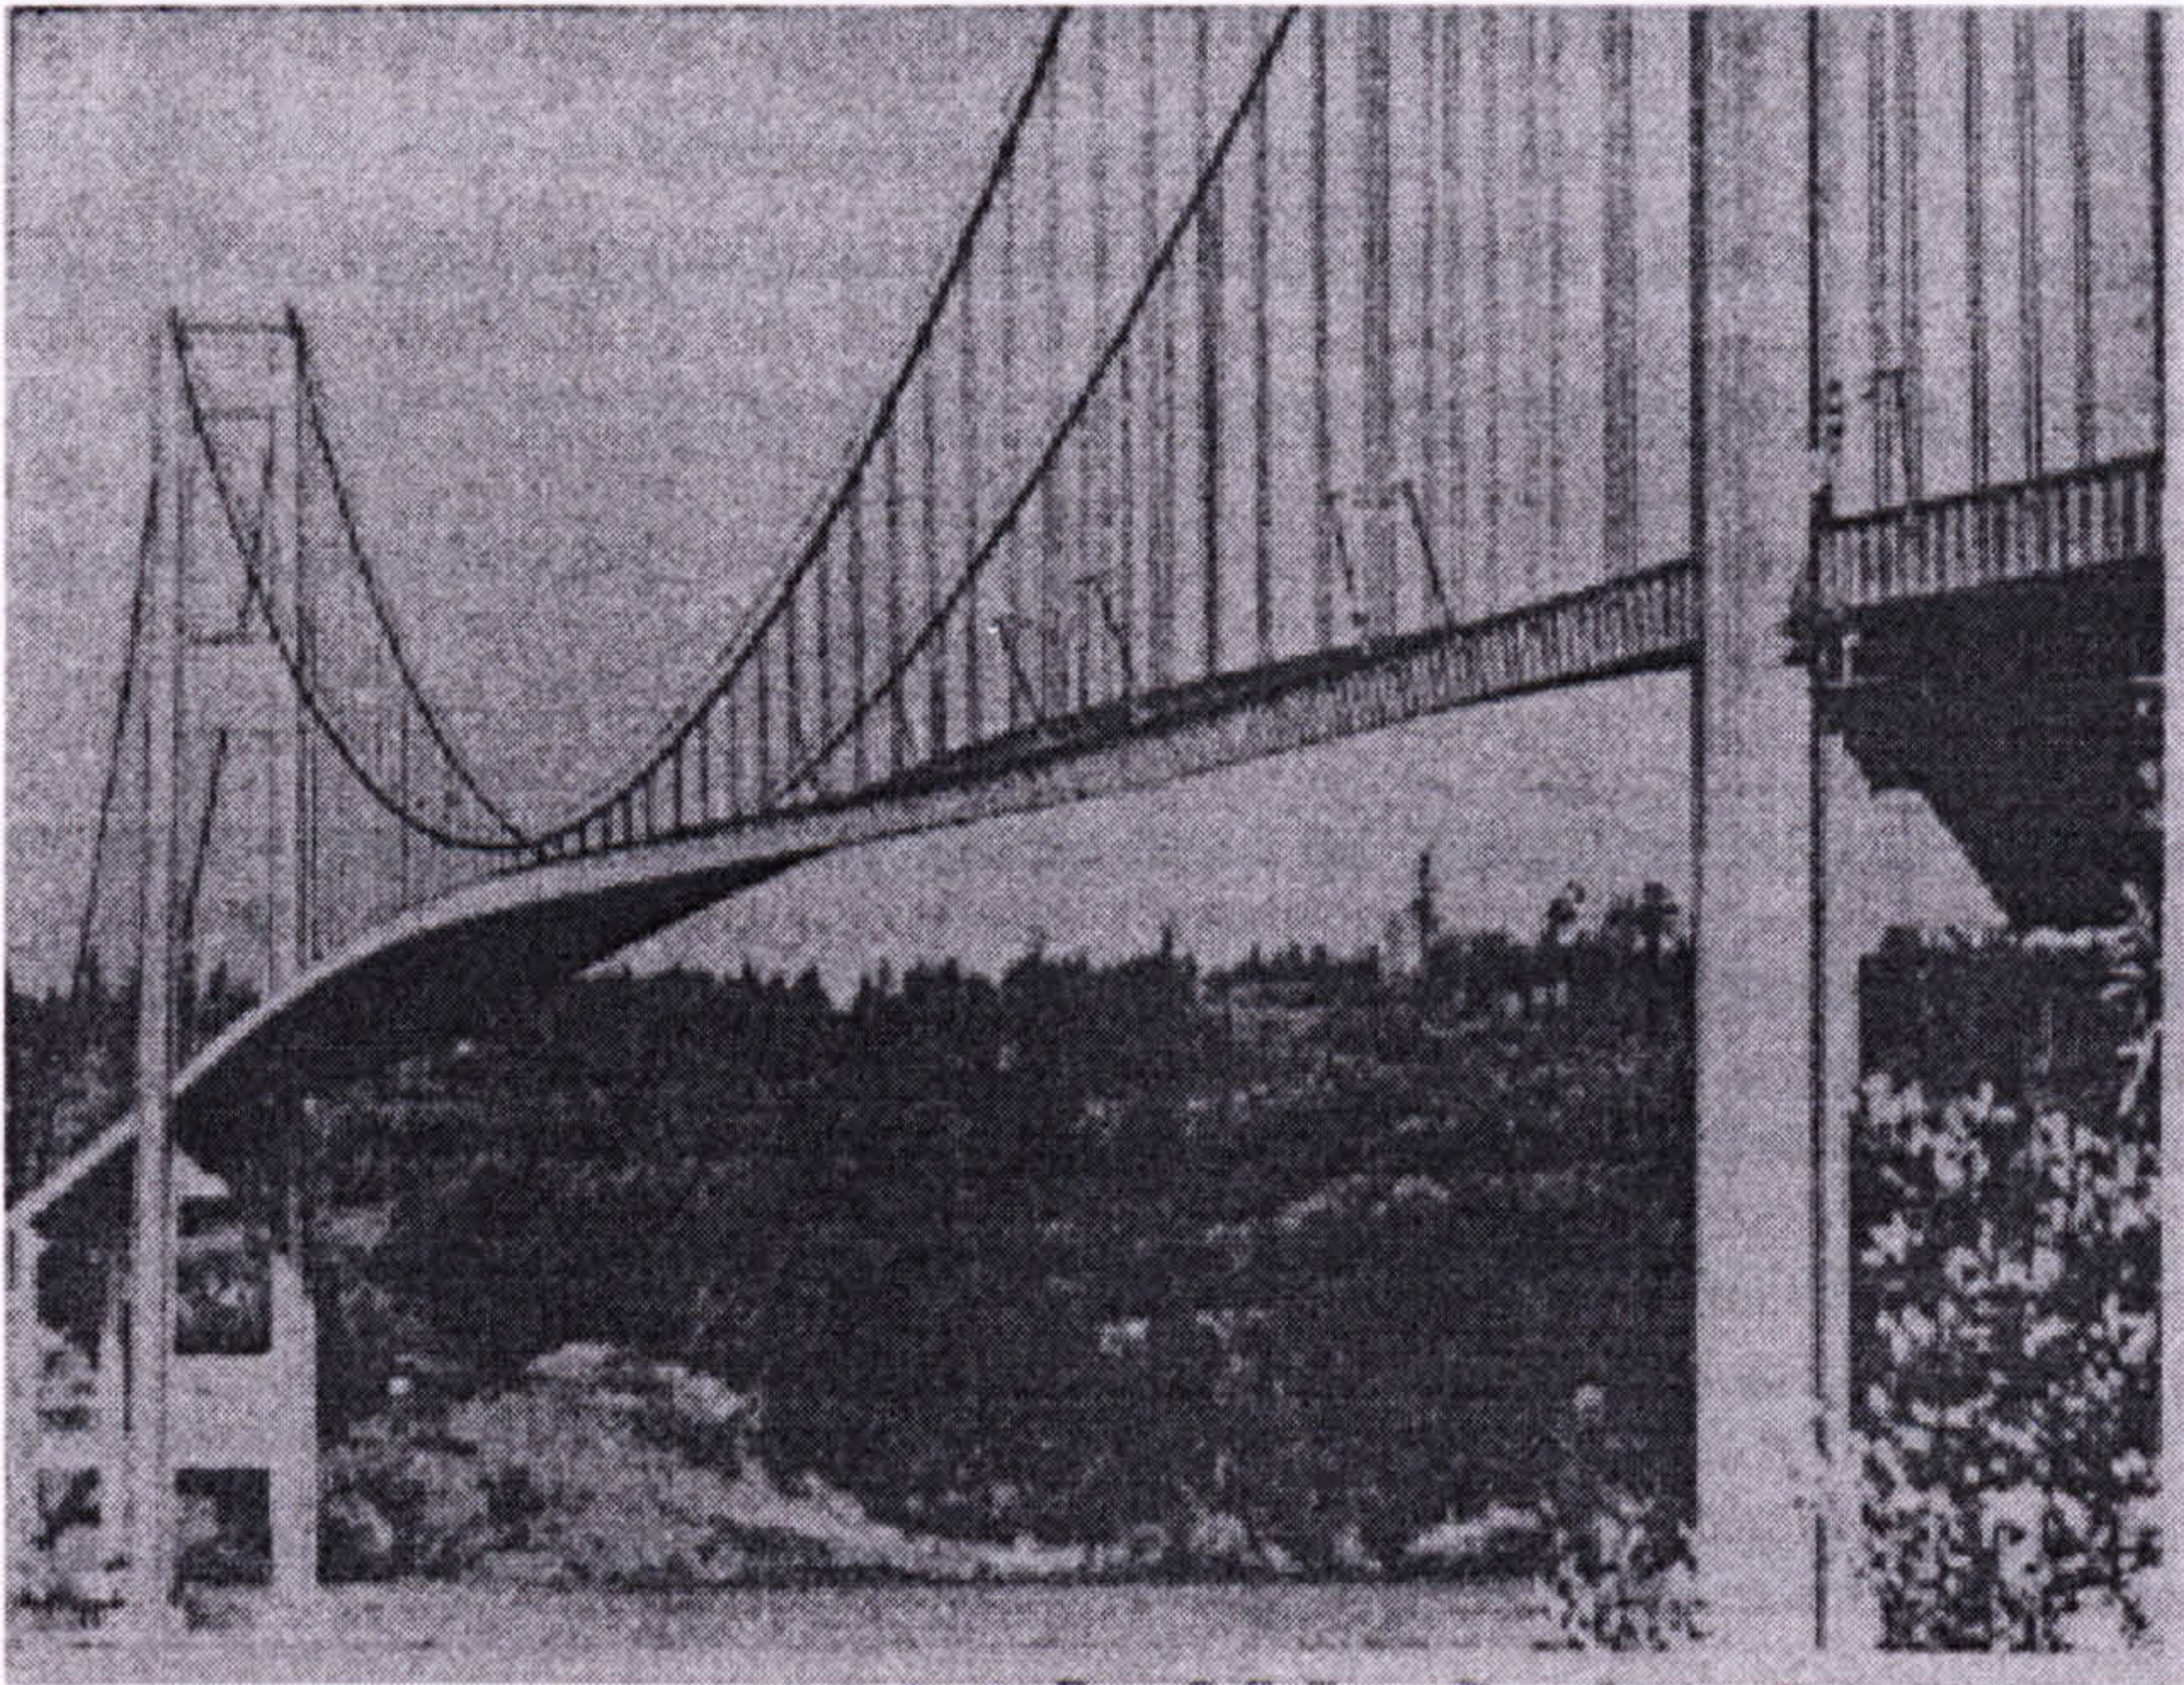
Tacoma Narrows Bridge failure of 1940.
